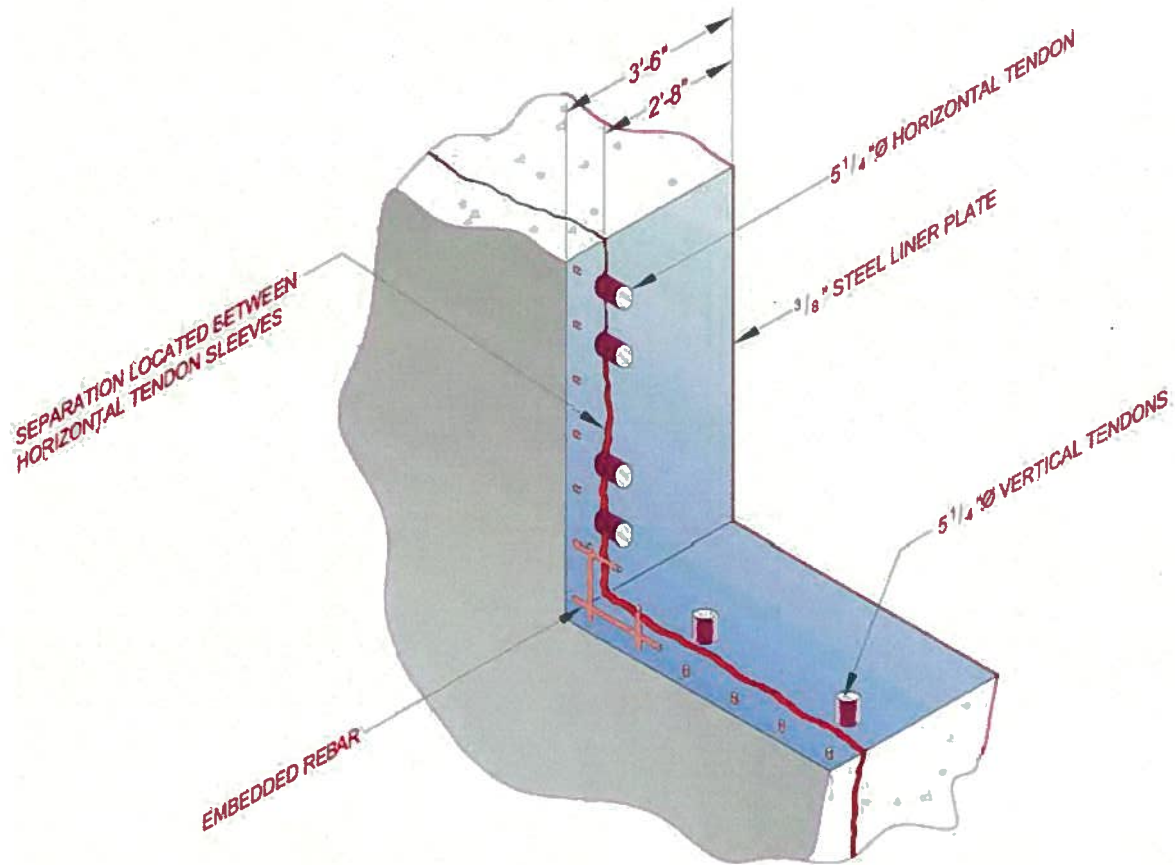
Sketch of the delamination cracking in the bay 34 wall.
